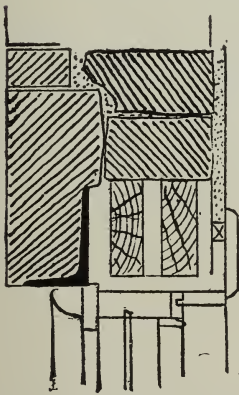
Steel Angle-bar, Full Length of Stone Cap. Cap Less Than Six Feet Long.
